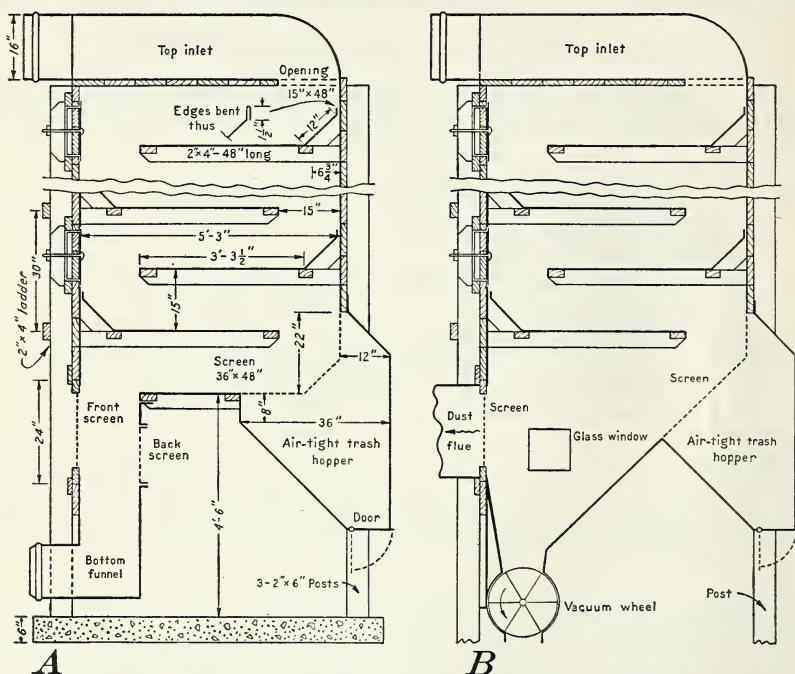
Construction details of ground level (A) and elevated (B) drying towers.
